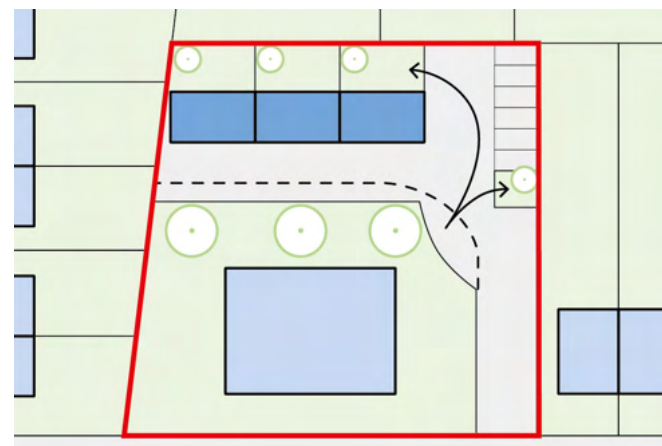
Post development simplified urban greening plan for minor proposals of fewer than 10 units.
